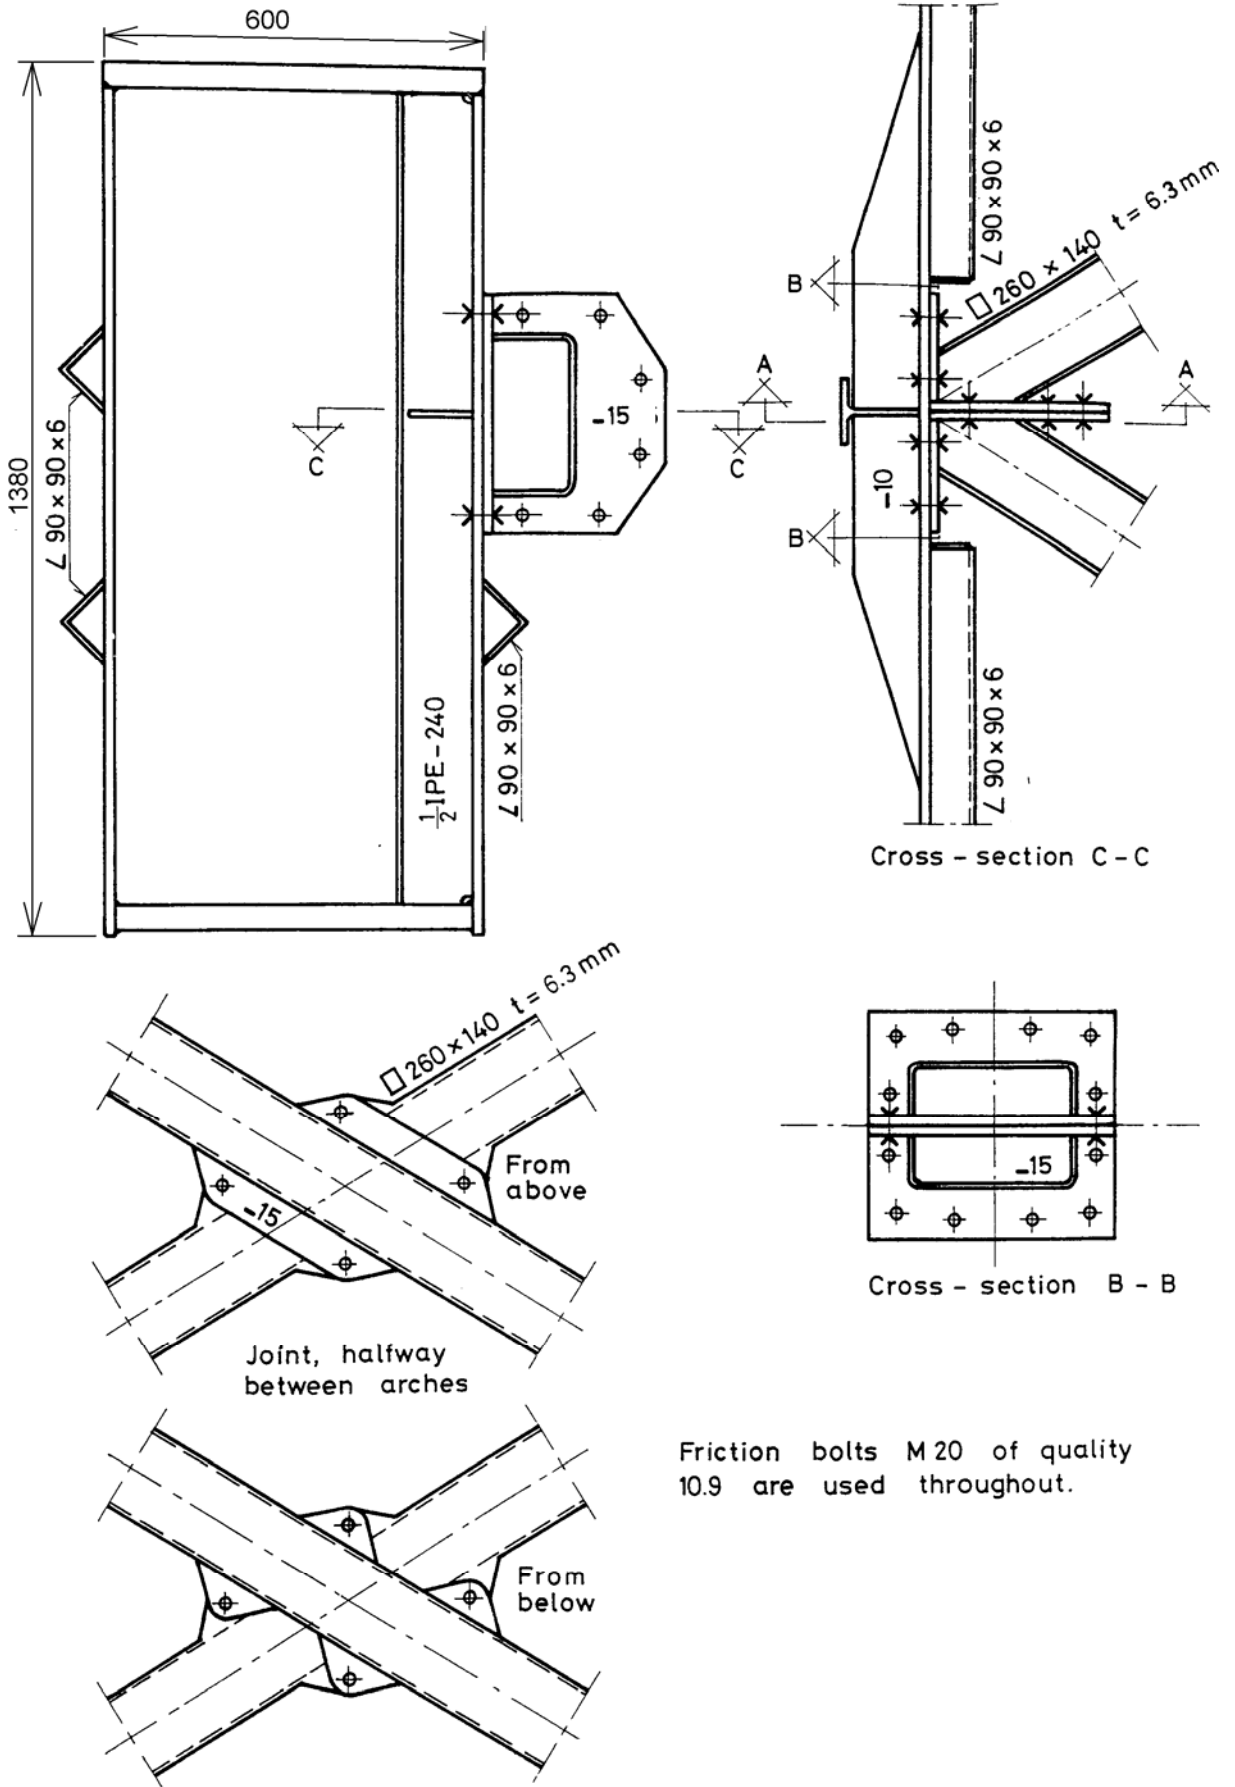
Details of arch and windbracing in 200A. Tveit 1980a.
